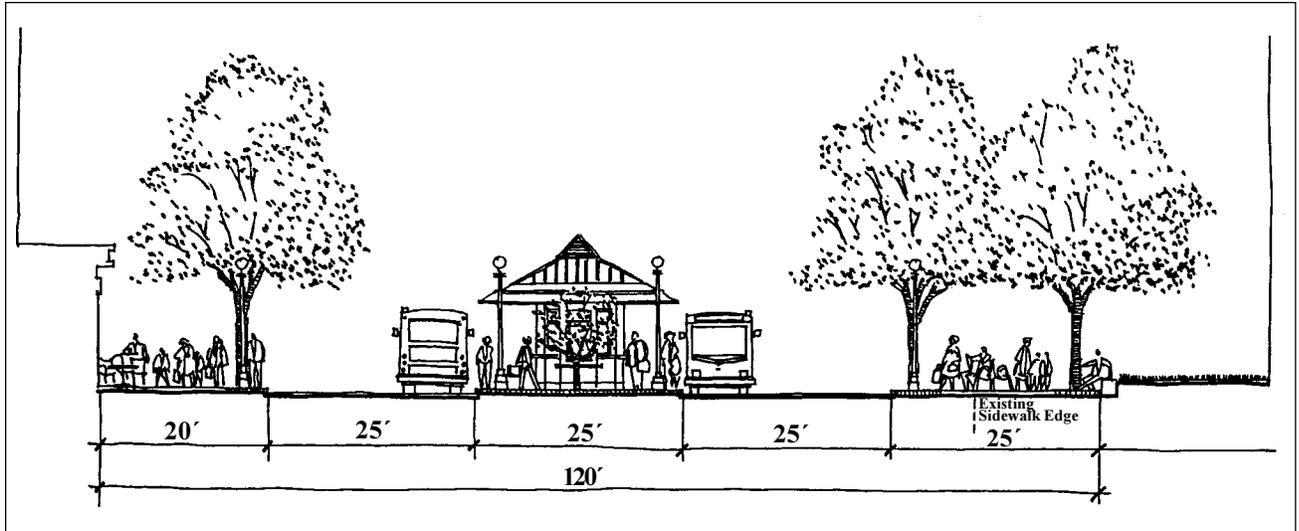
"Transit Central" West End Section – West End – Widened Sidewalk Along North Side
